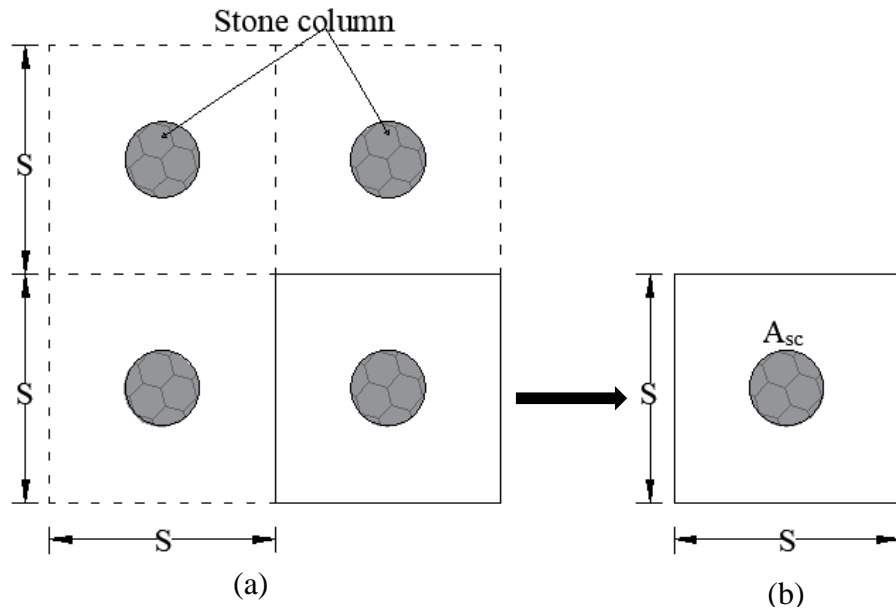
(a) Typical stone column arrangement (b) Unit cell
